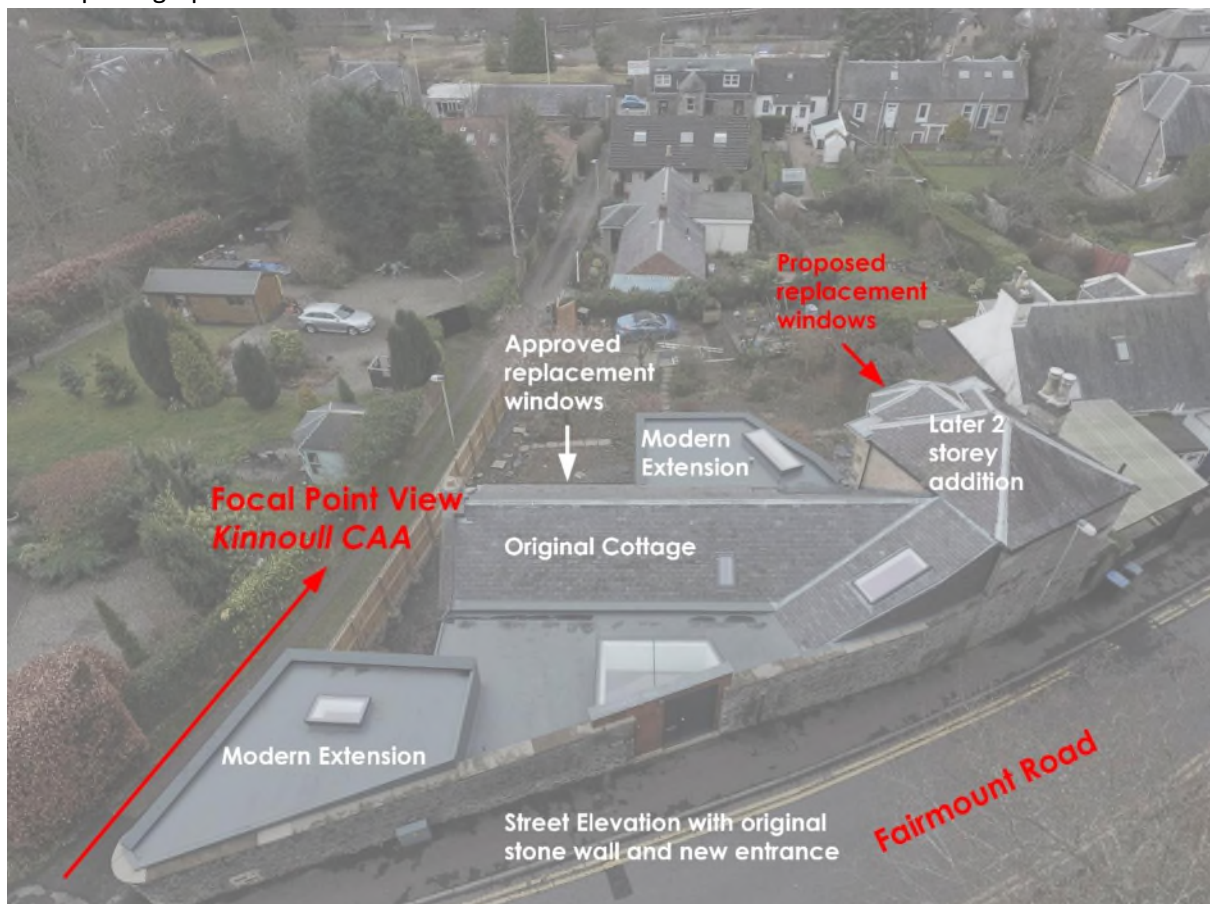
Aerial Photograph looking West to Perth from Fairmont Road
